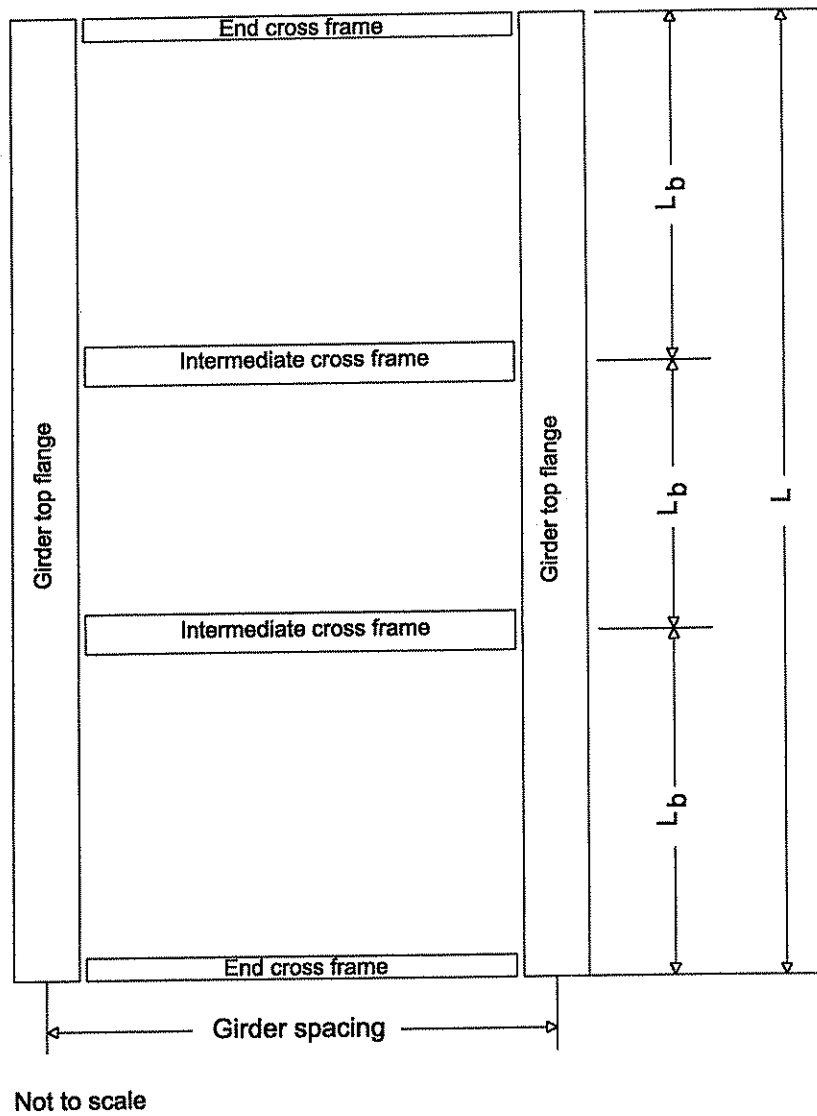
Plan view of top flange indicating the unbraced length between cross frames
